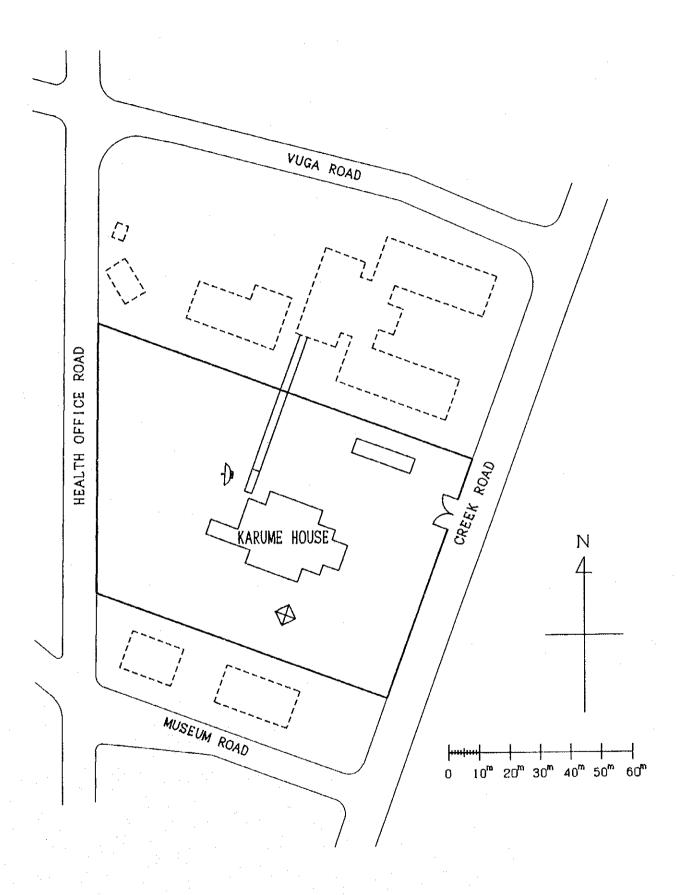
SITE LAYOUT OF KARUME HOUSE
